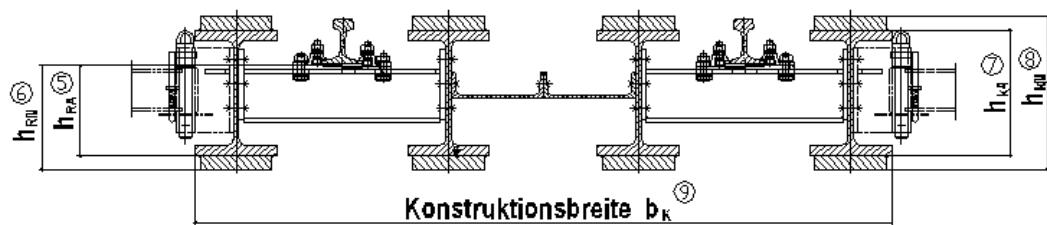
Cross Section of a Temporary Bridge used by DB. From ML-D3.1 (2013)
